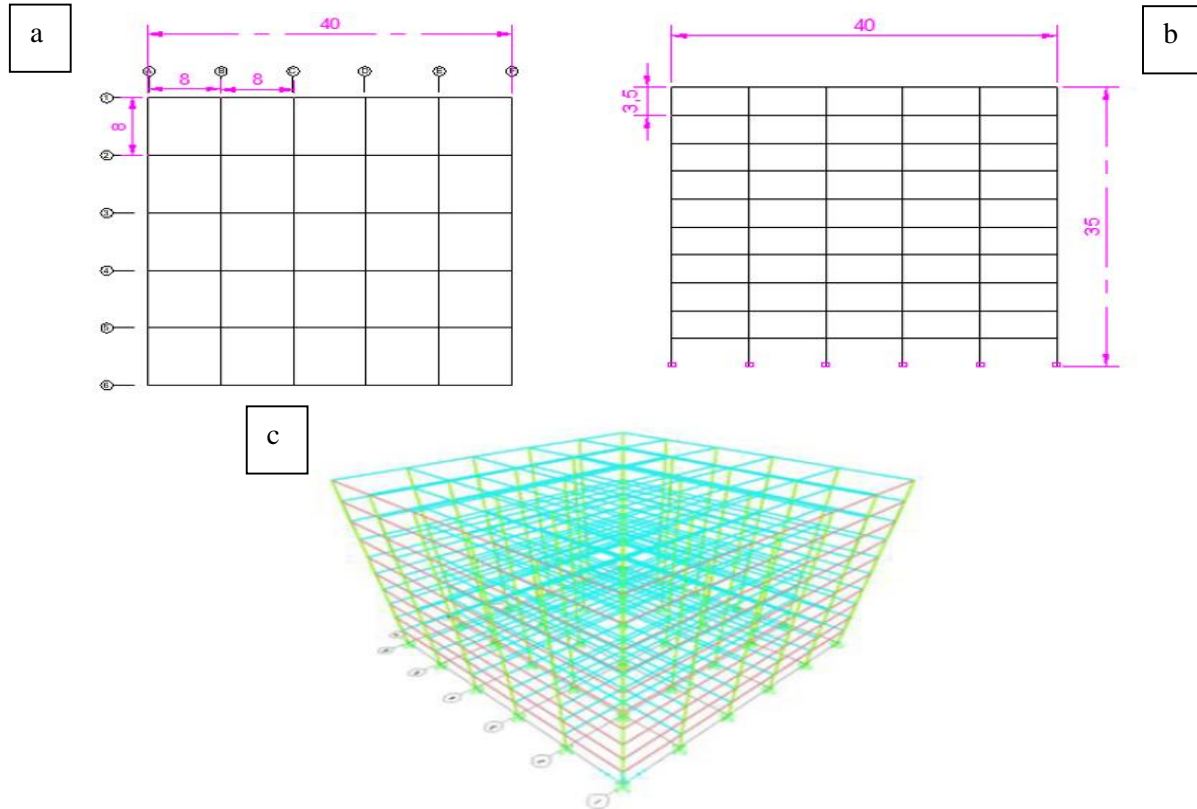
a. Plan View, b. Front View, c. Finite Element Model of the RC Building (the units are in m)
